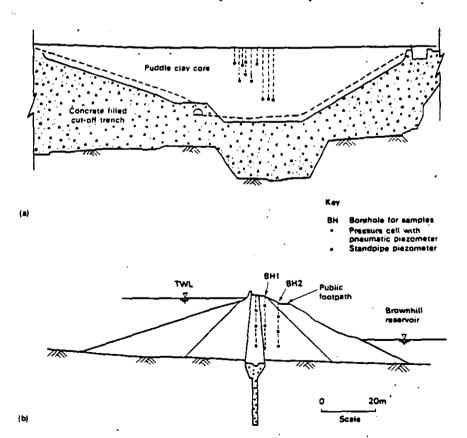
Ramsden dam; (a) longitudinal section; (b) transverse section
